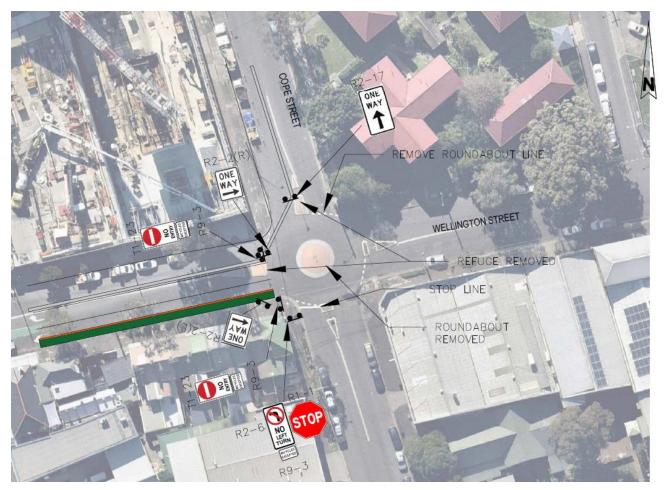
Cope Street / Wellington Street CTMP Layout
